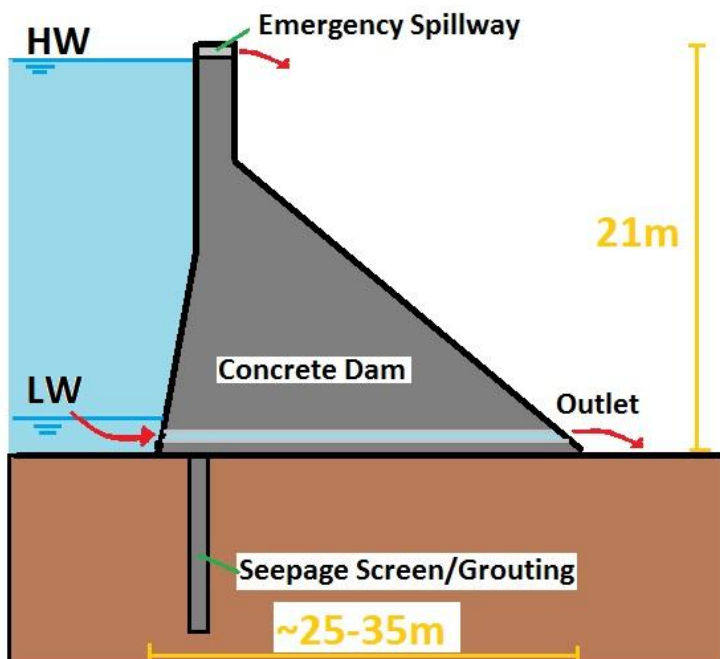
SCHEMATIZED SIDE VIEW OF CONCRETE DAM
